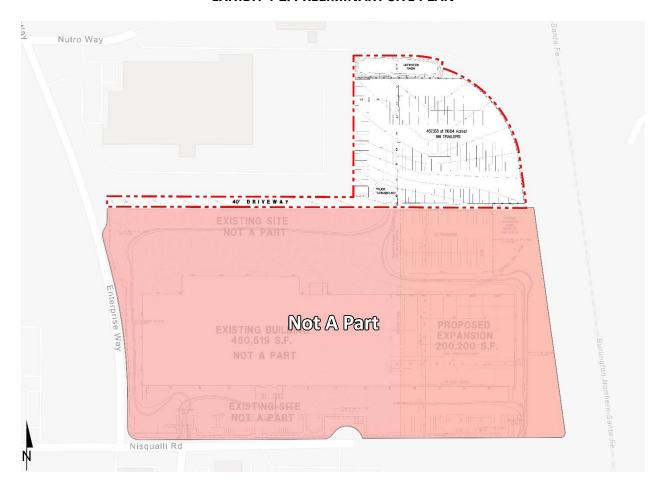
PRELIMINARY SITE PLAN
